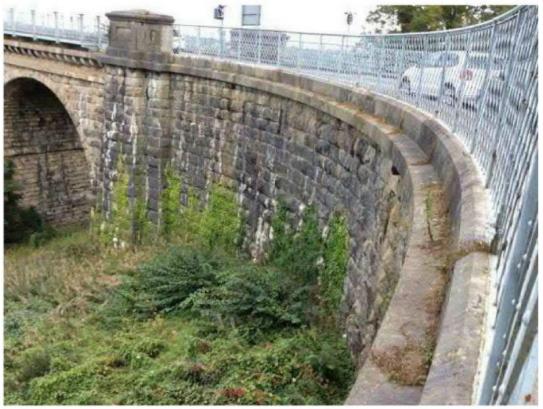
Wing wails - Ivy to lower parts of south west wing wall
